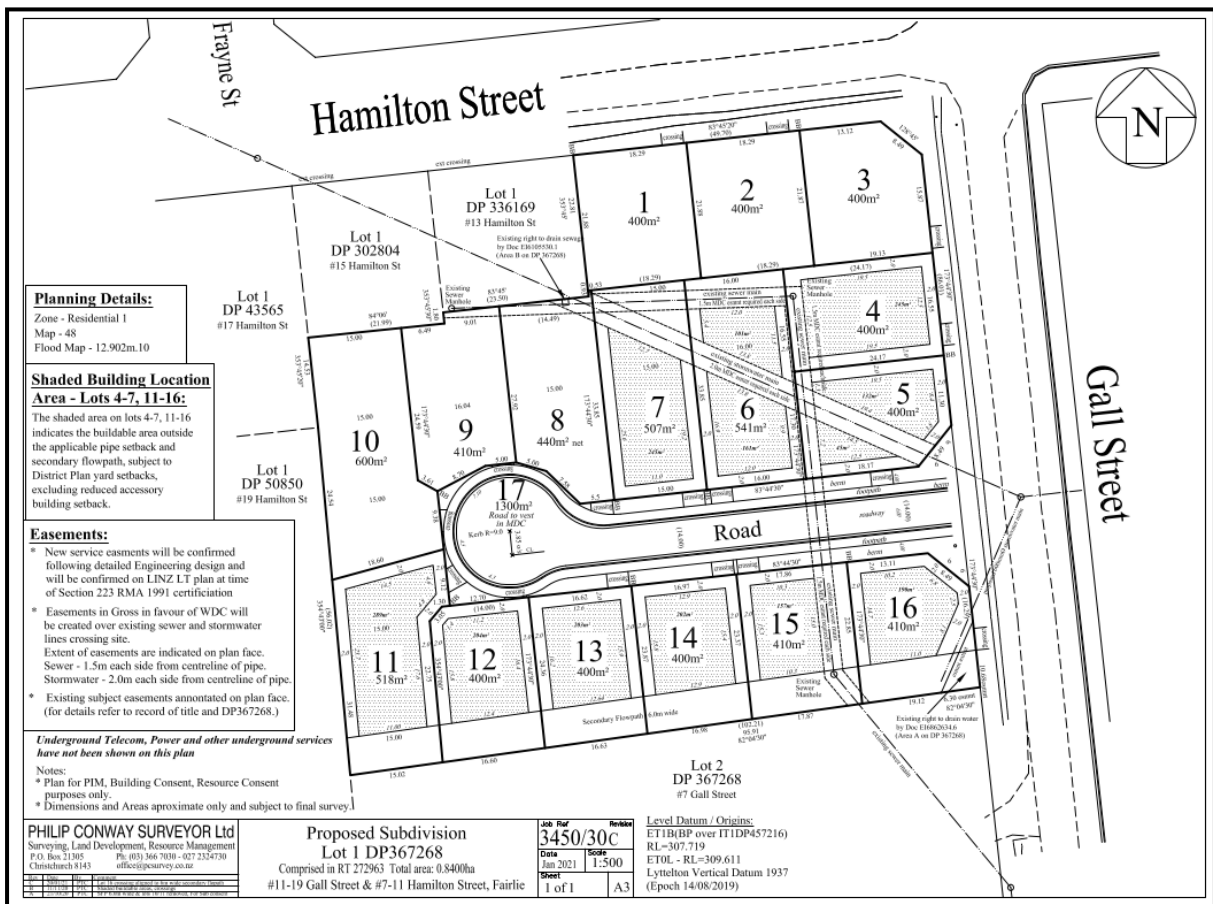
Subdivision Scheme Plan. Dated November 2020 (Source: RM200077 AEE)
